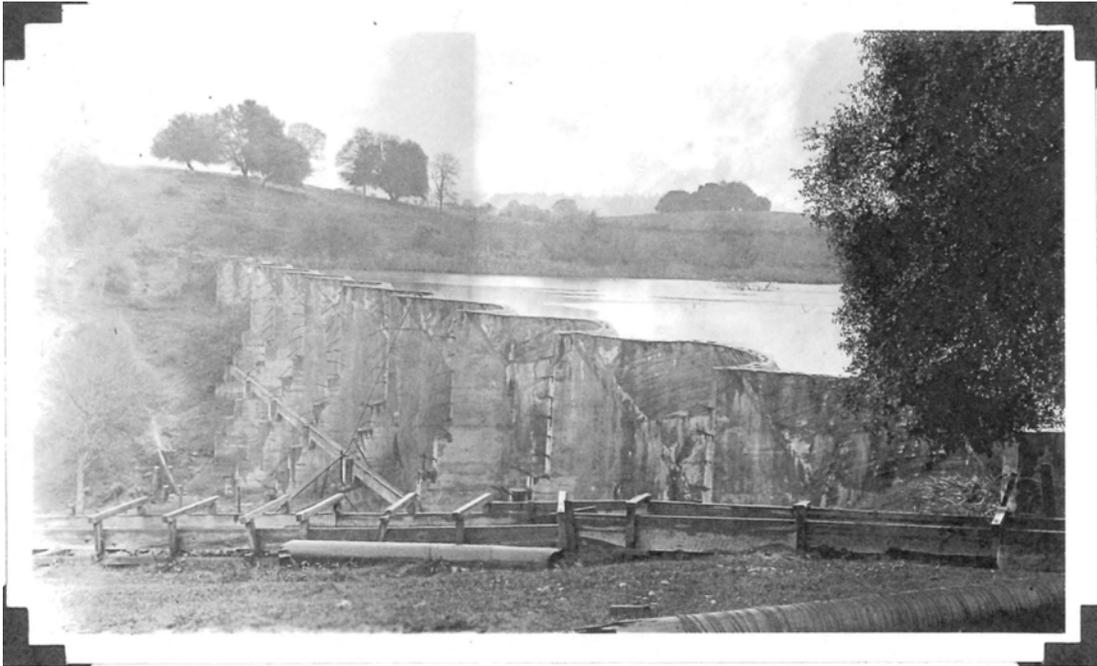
View from Downstream Left Abutment Looking Towards Right Abutment. Spillway Sluice Box in Foreground. Concrete-Box Spillway Not Shown. (1931).
